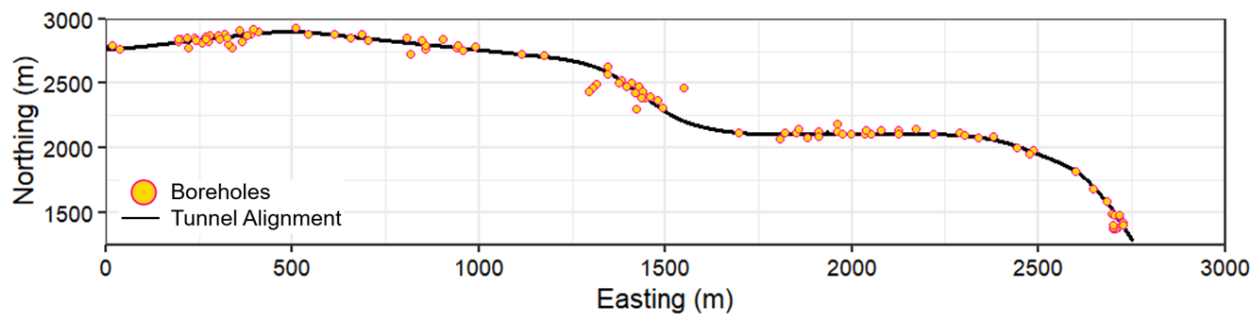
Plan view of the tunnel alignment with borehole locations.
